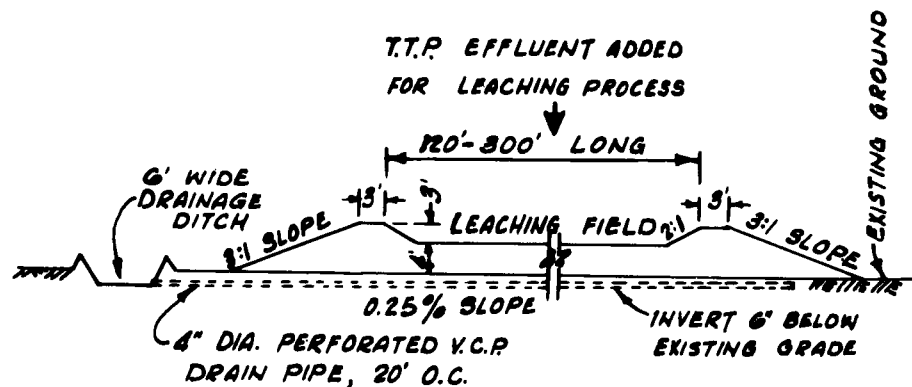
SOIL RECLAMATION PROCESS AT PARK SITE
